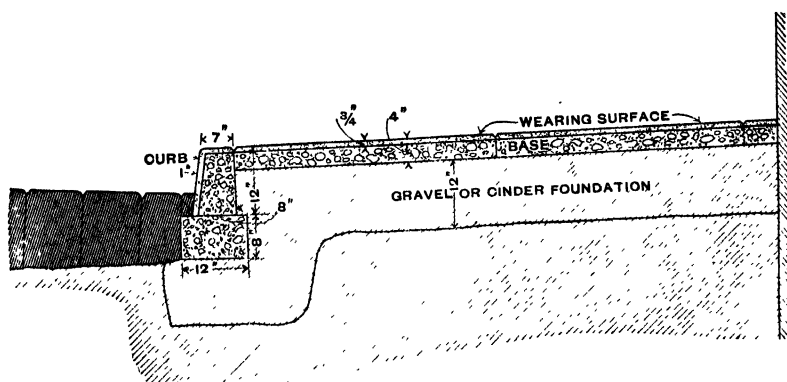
Typical Concrete Sidewalk and Curb. (See p. 806.)
